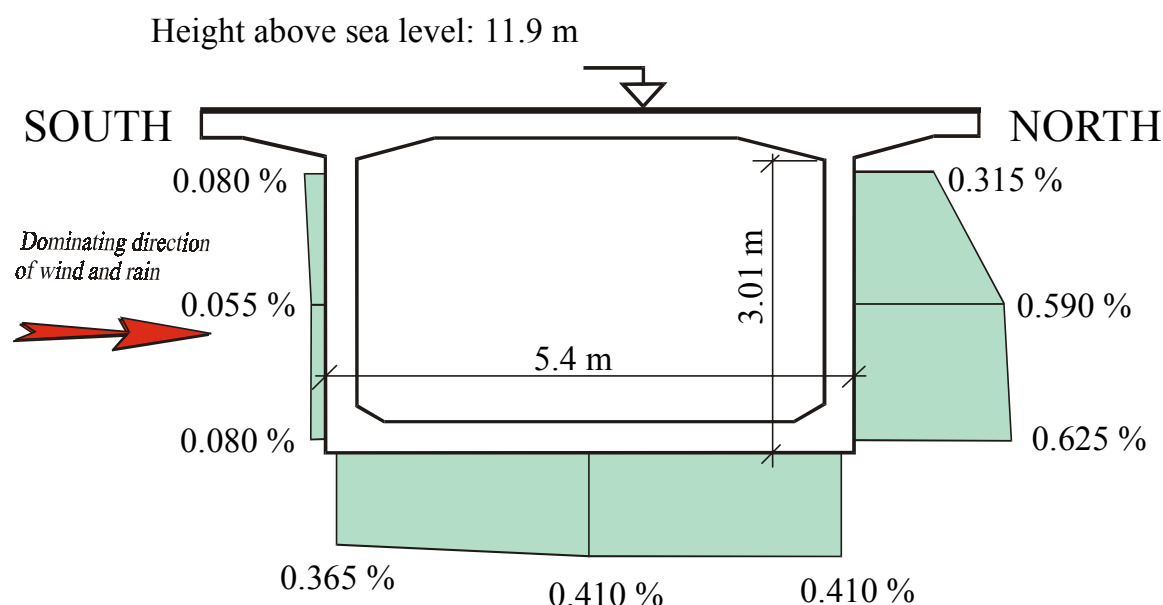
Chloride content on the concrete surface C_s , computed from measurements on the cross-section 11.9 m above sea level, Gimsøystraumen bridge.
